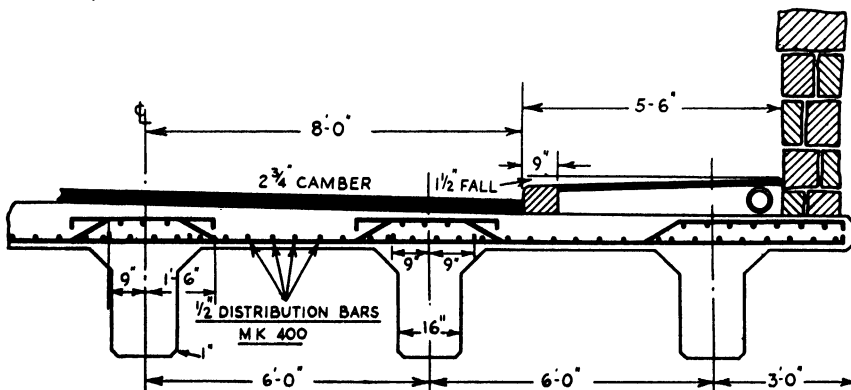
LAROCH BRIDGE: HALF SECTION THROUGH BEAMS AND SLAB.
